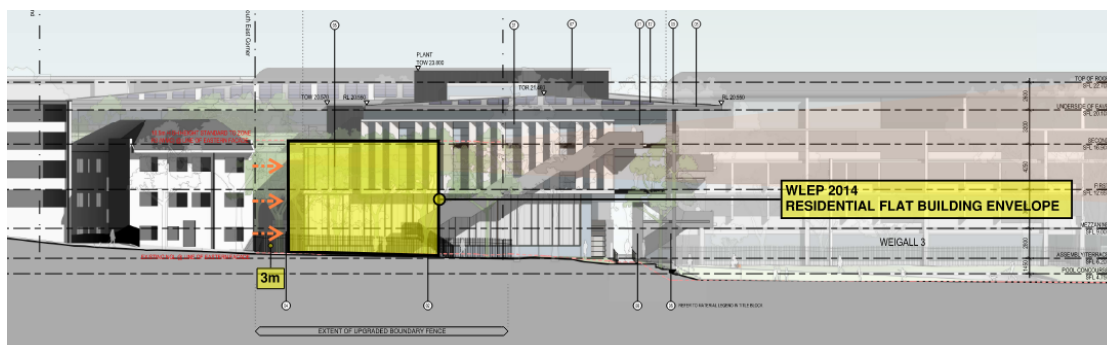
East elevation of proposed Building 1 showing the envelope of a compliant residential flat building (Source: AJ+C)
